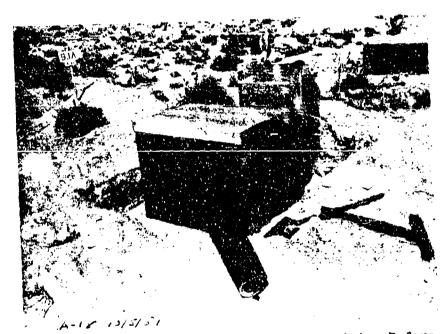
Shelter Structure A-18 in Position Before Backfilling (partly above grade)
